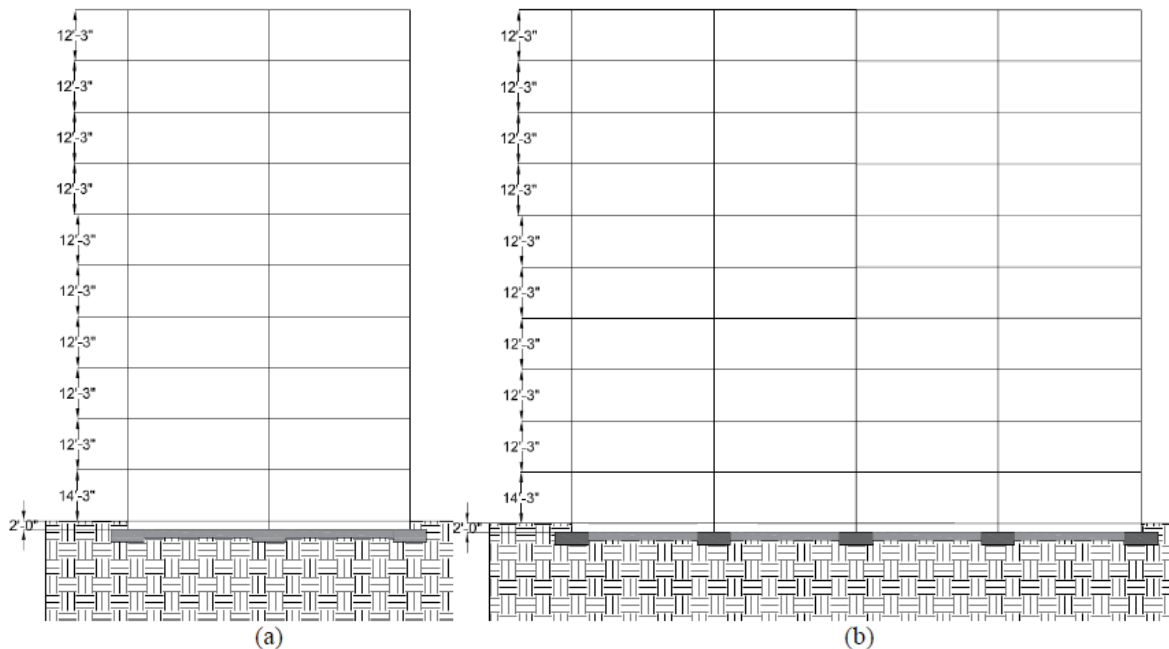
Elevation of typical moment frame a) north south direction, b) east west direction
